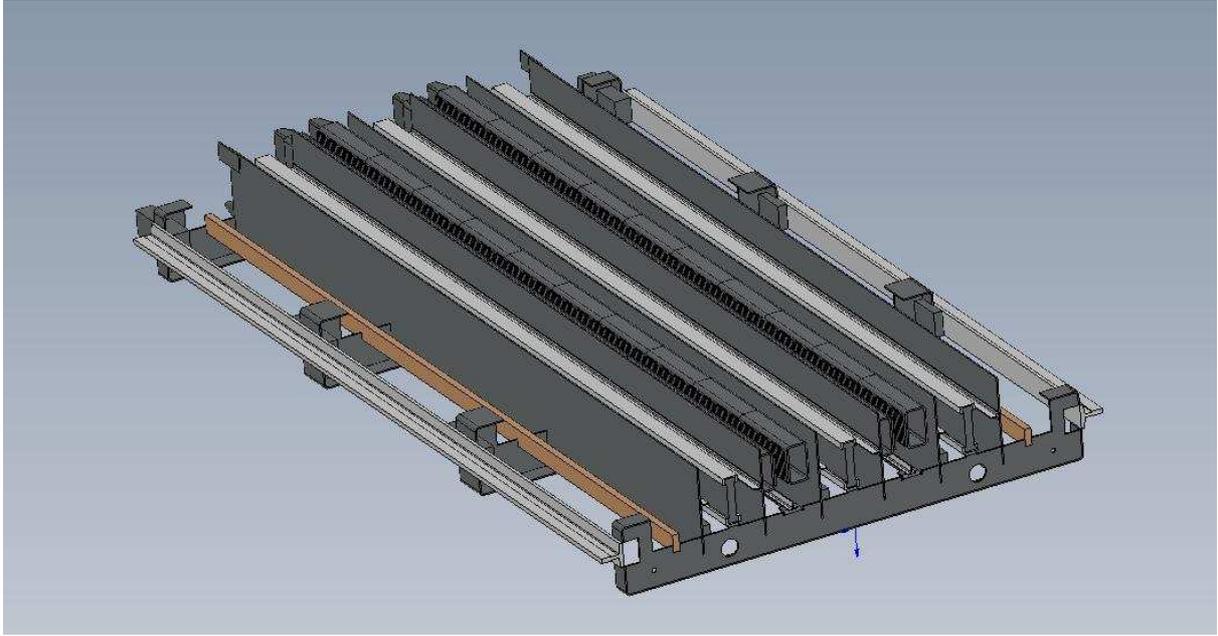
shows a possible arrangement of the track elements and structure to be built in 5m straight or curved sections
